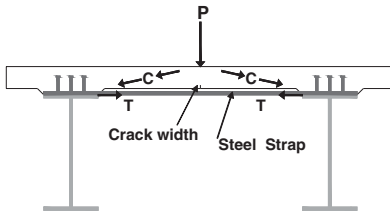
(b). Cross-section of a steel-free concrete bridge deck slab.
